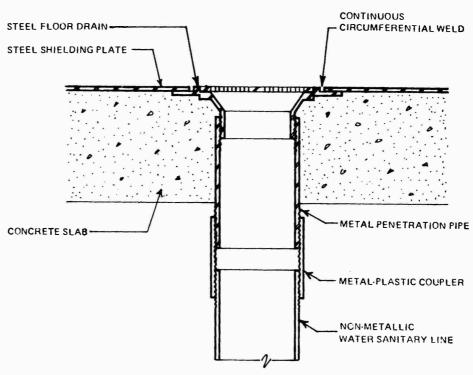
TYPICAL PENETRATION DETAILS PIPE & CONDUIT
